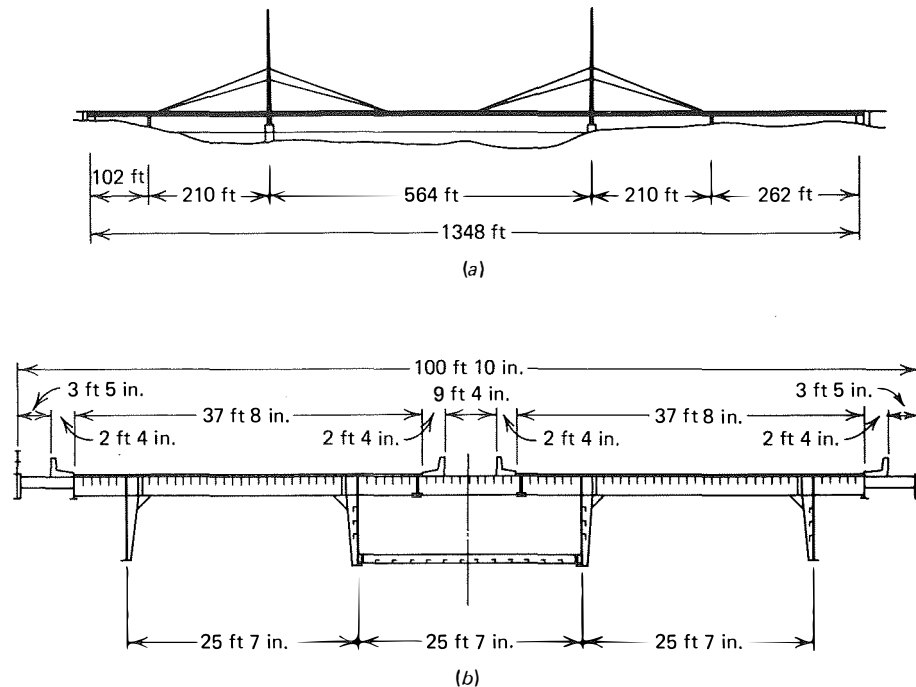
Norderelbe, Hamburg, Germany: (a) elevation and (b) cross section.
